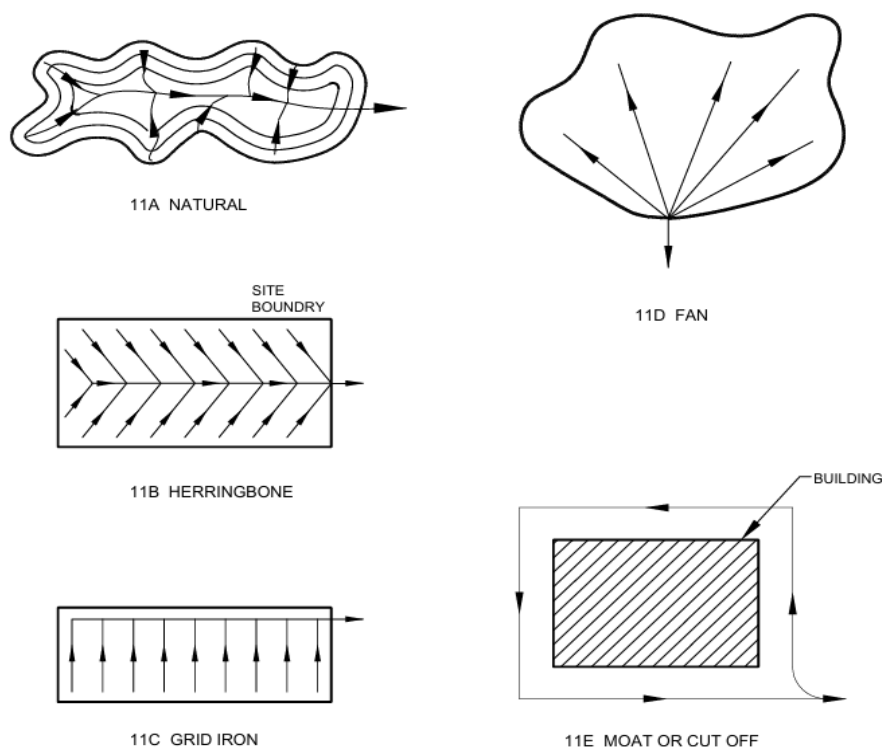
DETAILS OF SUBSOIL DRAINAGE SYSTEM
